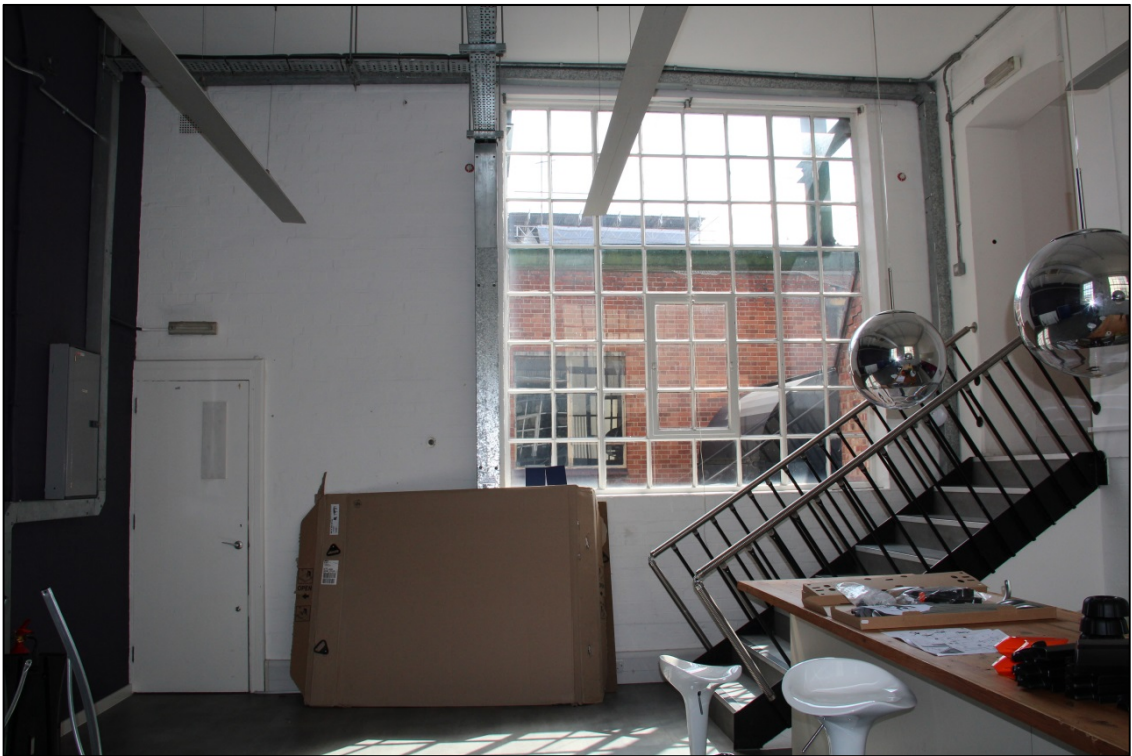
Second Floor of 60-70 Shorts Gardens
